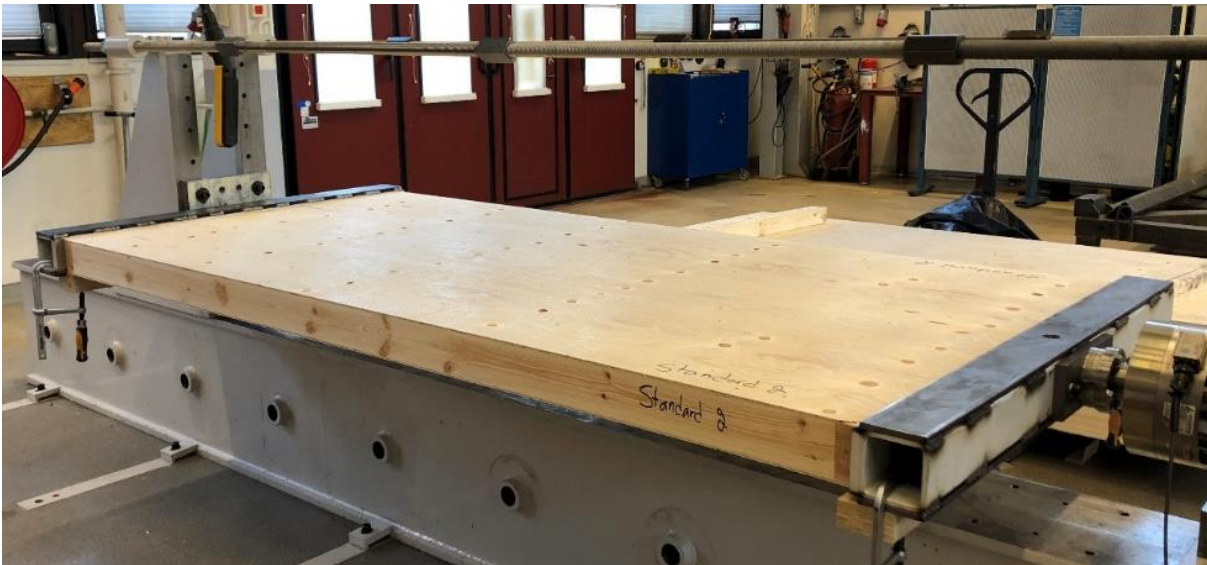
Test setup: an IsoTimber board under longitudinal compression (photo by Urban Haggström, RISE)
